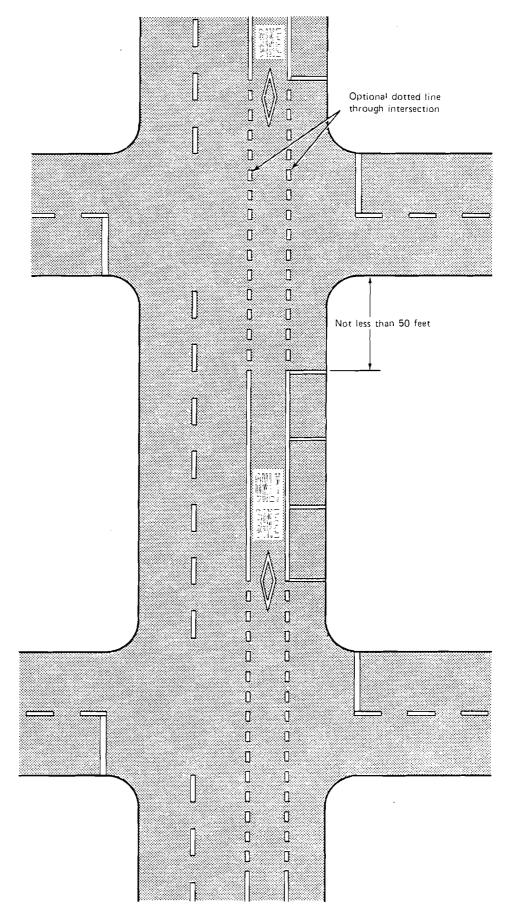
Typical pavement markings—designated bicycle lane, two-way traffic with parking and low right turn volume.
